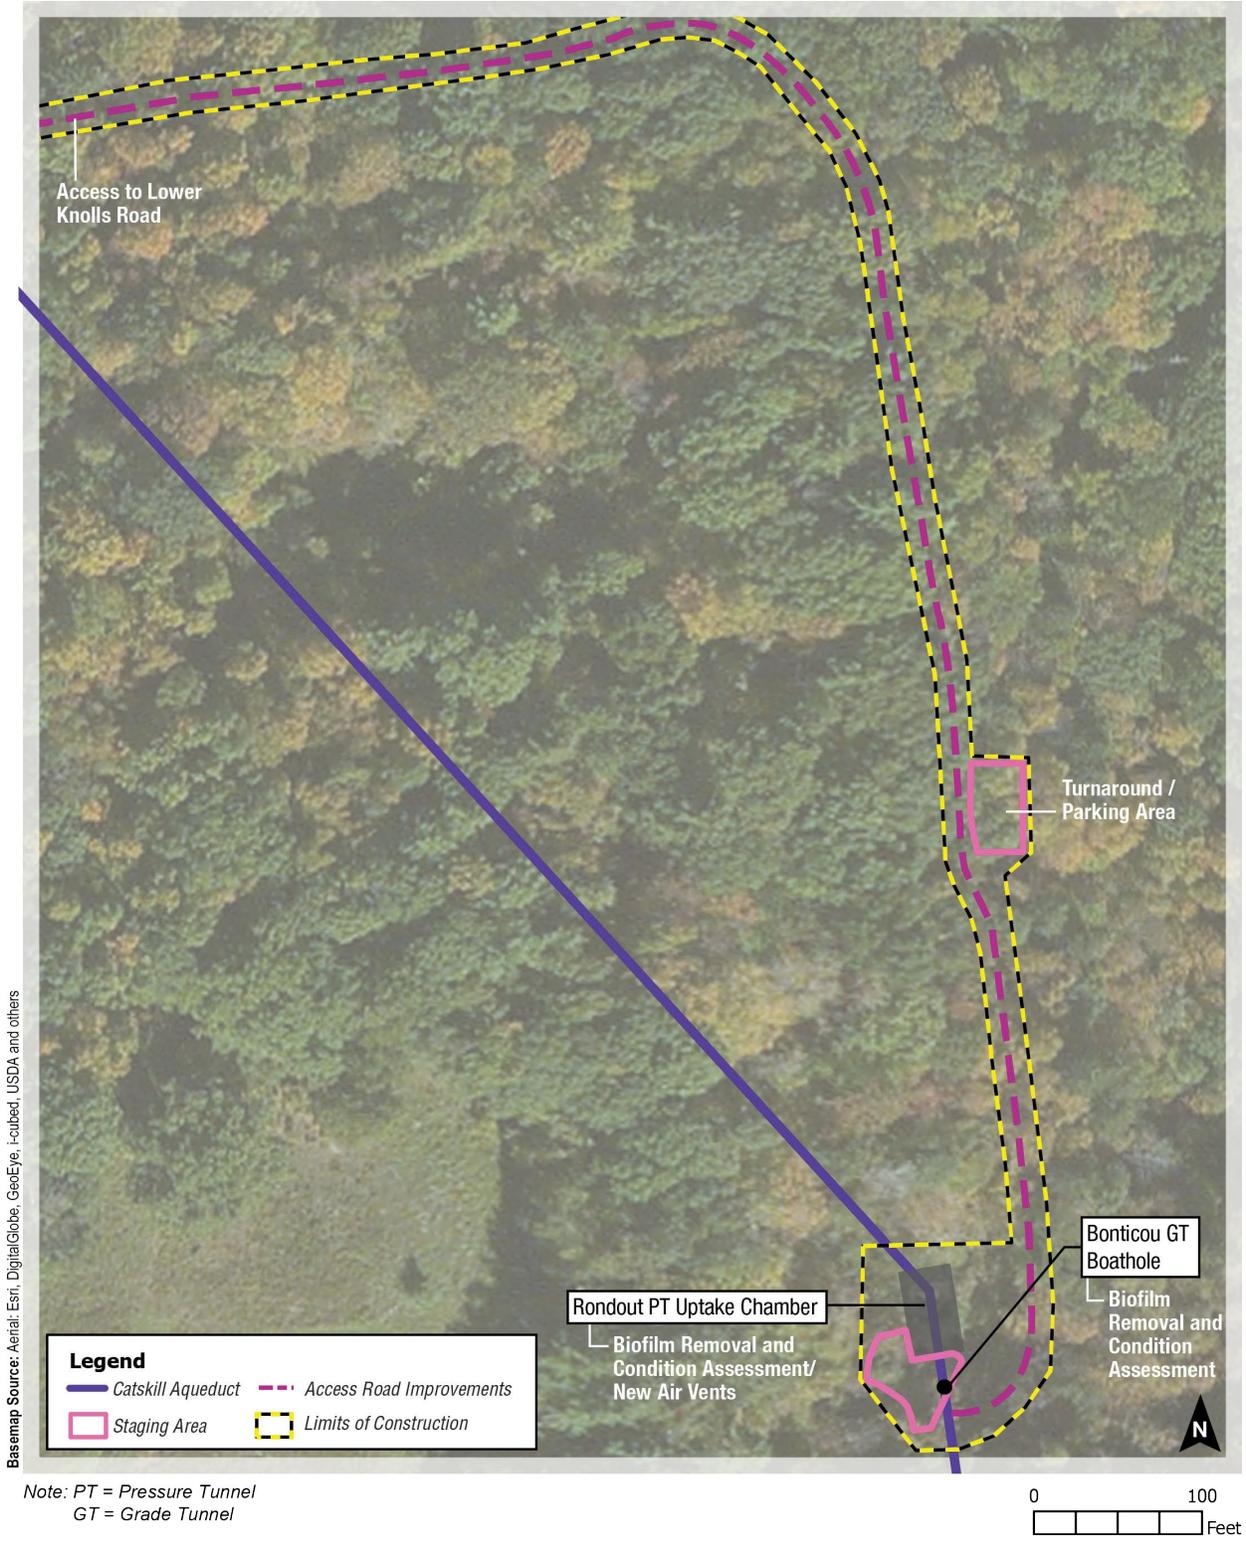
Site Plan – Lower Knolls Study Area
